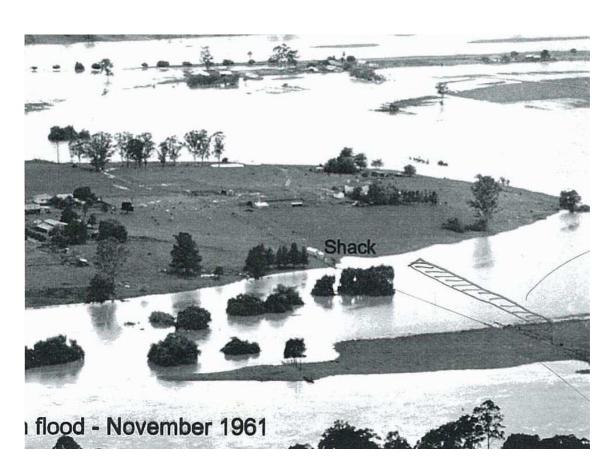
Photograph of flooding on the Nepean River and Hunts Gully Creek taken in November 1961, looking east. The Smith Road house and outbuildings are located on the hill in the centre of the image. The approximate location of the proposed Hunts Gully Weir is drawn in on the right of the image. A small building marked 'shack' is located just above the floodwaters. (Source: Stephen Rithenden PLDC, 1961)
